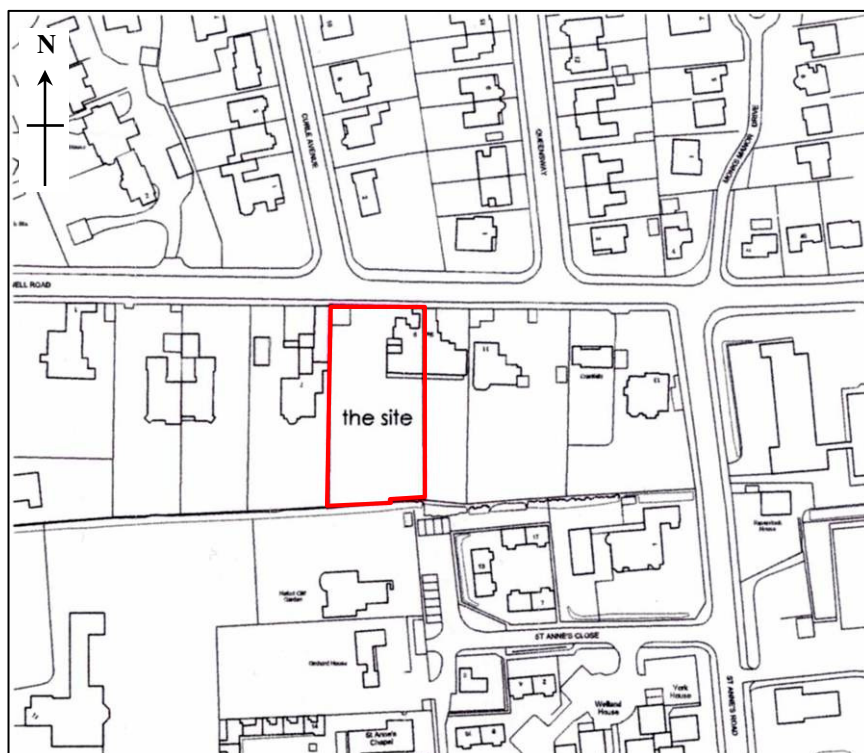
Location plan of the site at scale 1:1250. The site is outlined in red. Plan supplied by client.
